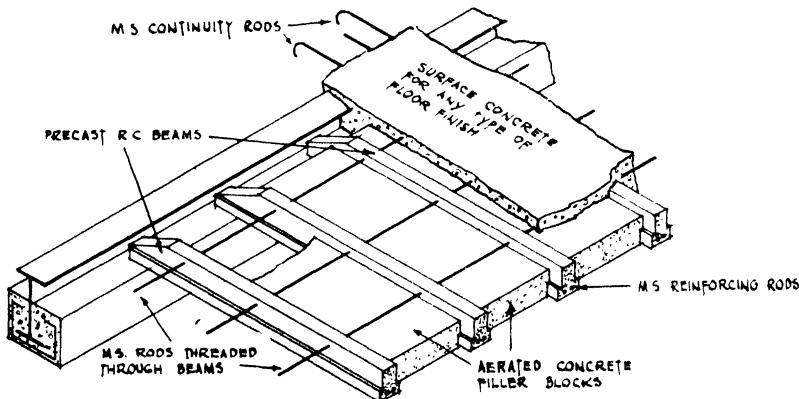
PRECAST CONCRETE FLOOR USING REINFORCED-CONCRETE BEAMS AND AERATED CONCRETE FILLER BLOCKS
